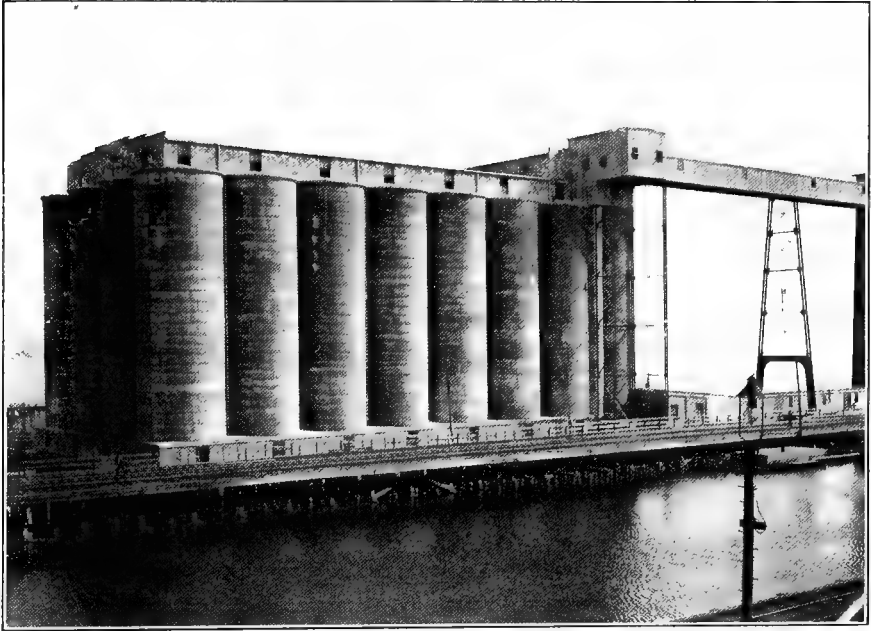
TYPICAL CONCRETE GRAIN ELEVATOR.
